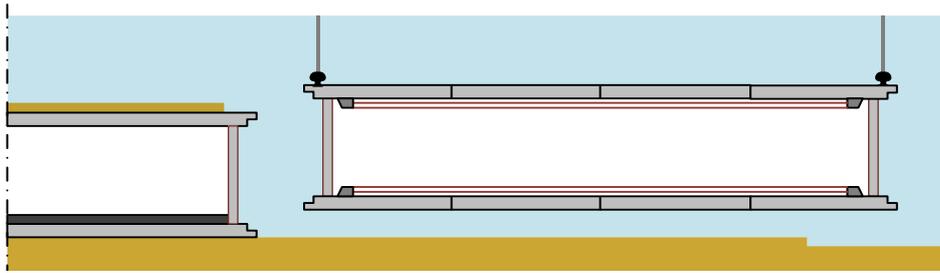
, LIFTING SINGLE ELEMENT, INCLUDING PRESTRESSING; LONGITUDINAL VIEW
